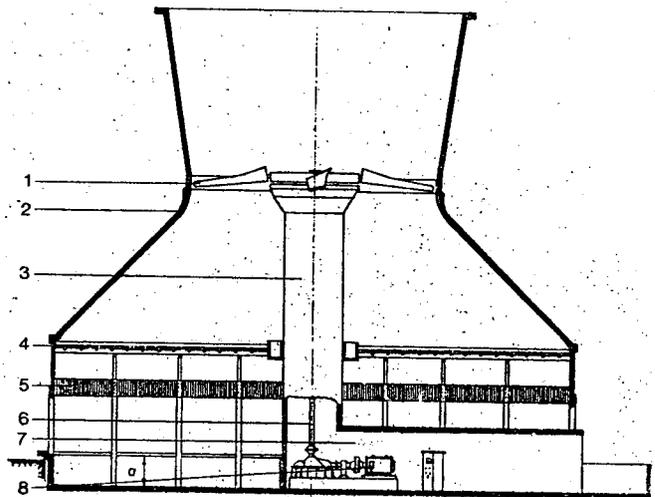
Cutaway view of circular mechanical draft cooling tower.
